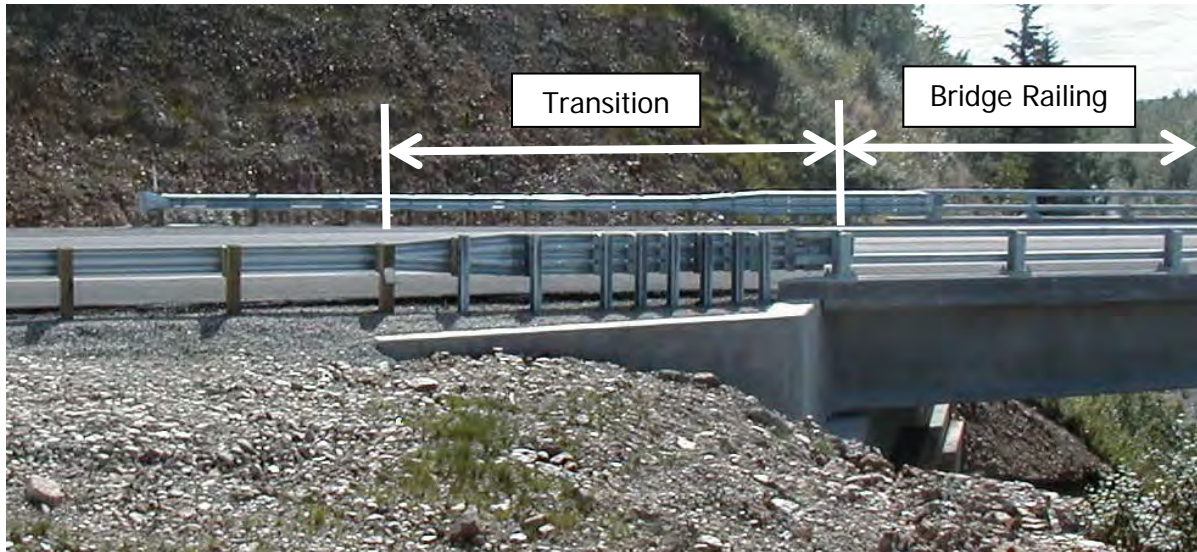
Metal bridge railing and transition. (Source: Alaska DOT)
